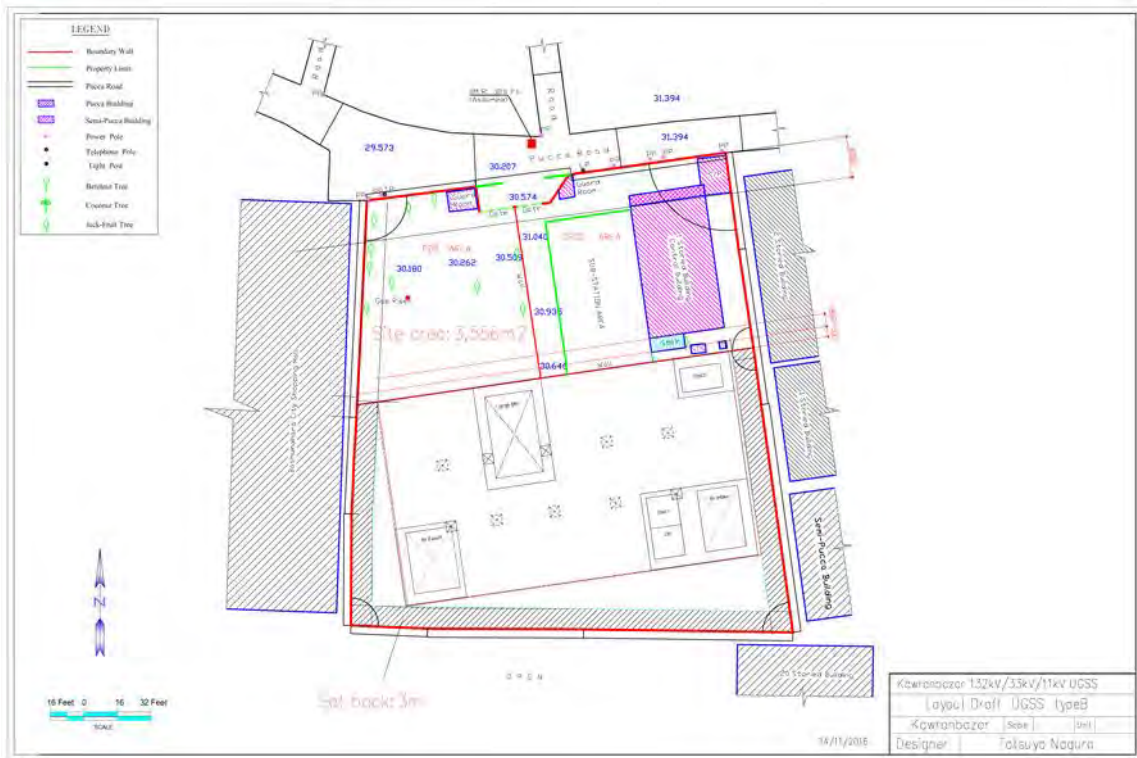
Ground floor layout of Kawran Bazar Underground Substation (Plan B)
